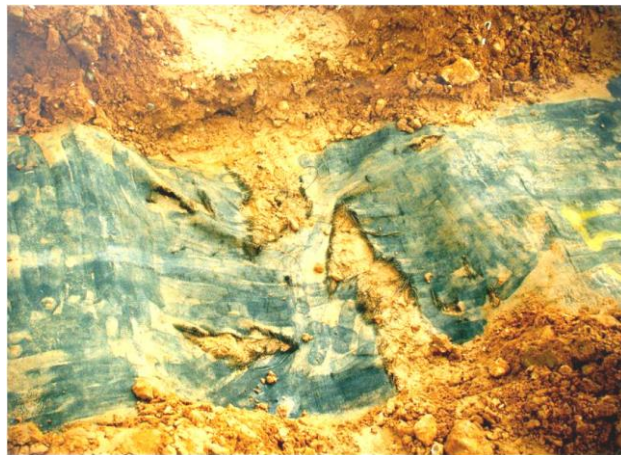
Deformation failure of geotextile due to traffic load.
